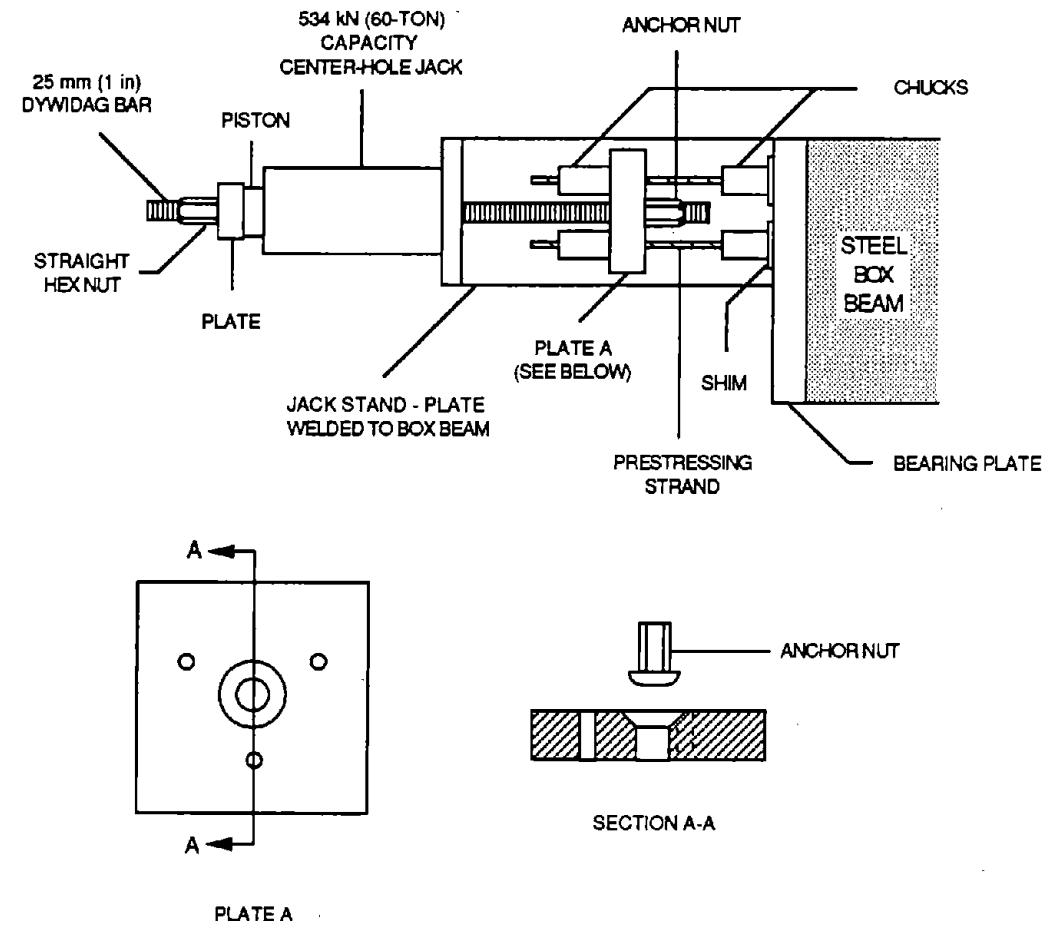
Jacking assembly for precast concrete Zone 4 specimens.
